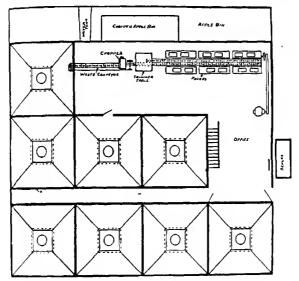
Fig. XIII .- First-floor Plan, Eight kiln Evaporator.
